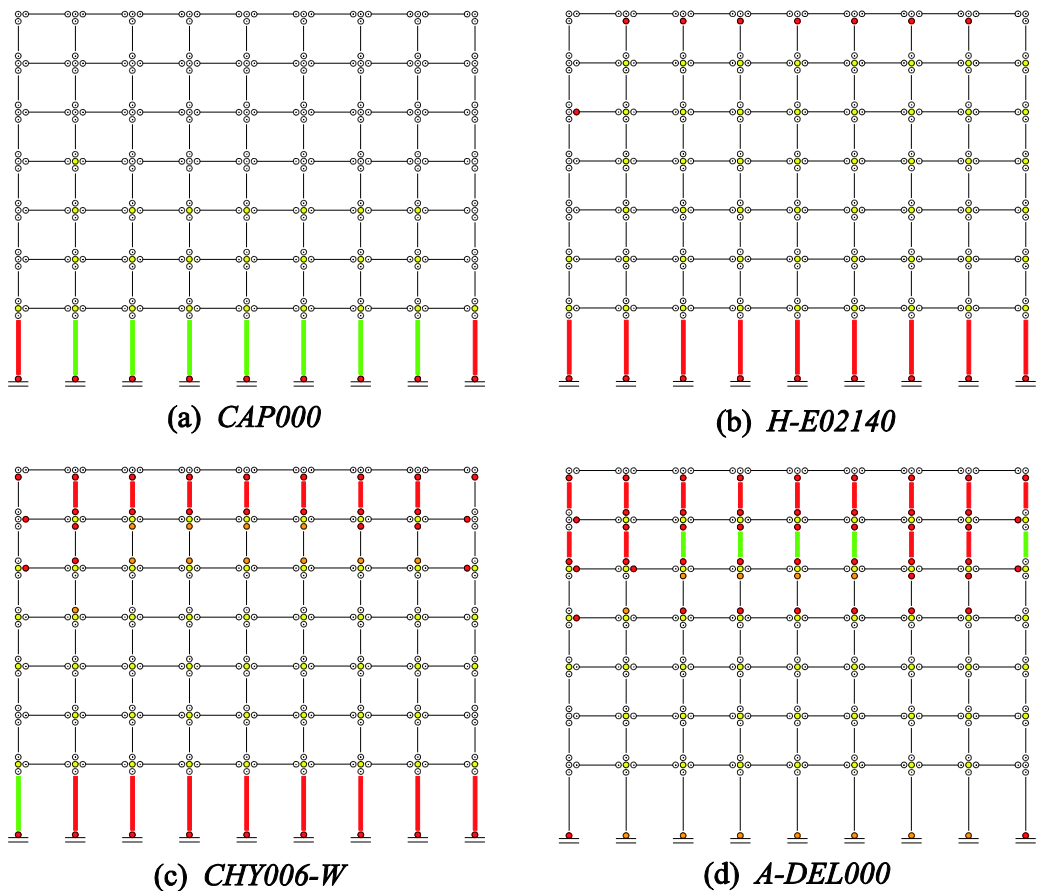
Diagrams showing dynamic collapse modes for the American building
